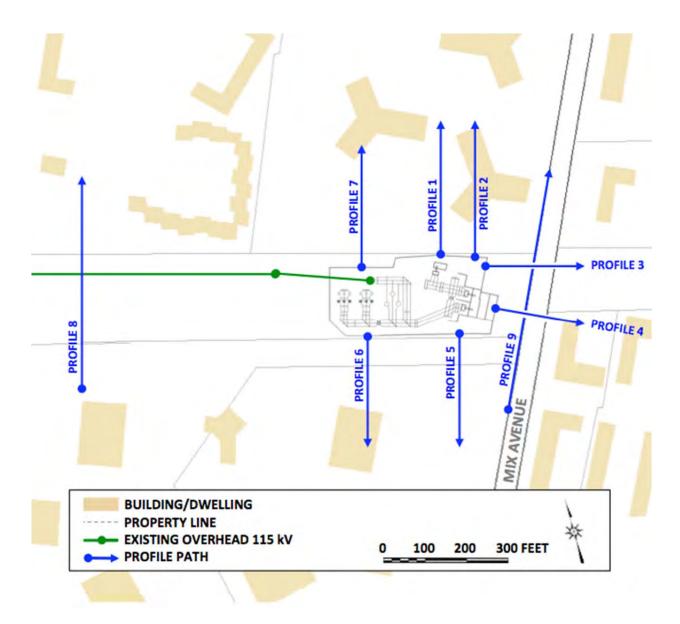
Plan view of the proposed Mix Avenue Substation, showing the proposed substation fence and the location of calculated profiles.
